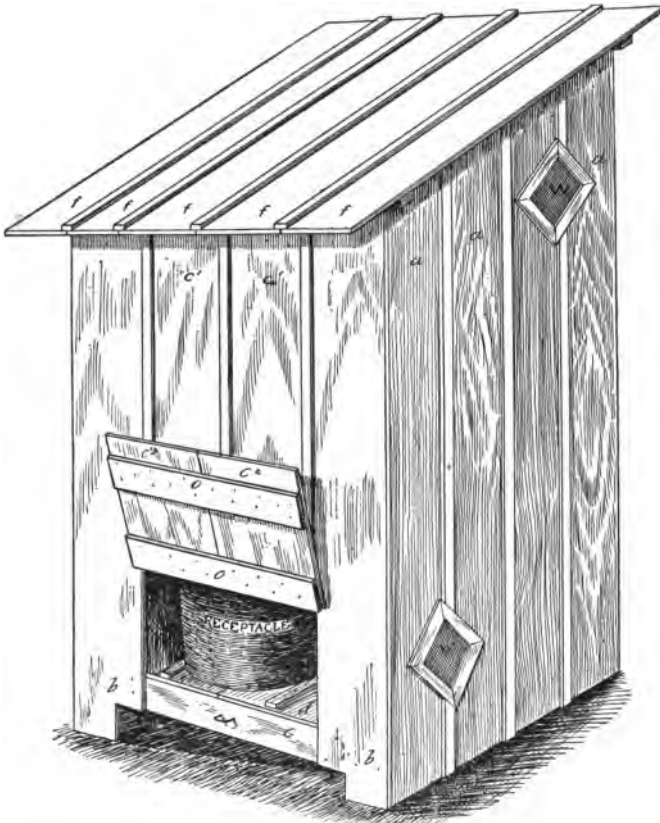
Rear view of single-seated sanitary privy. (Redrawn from Stiles.)
